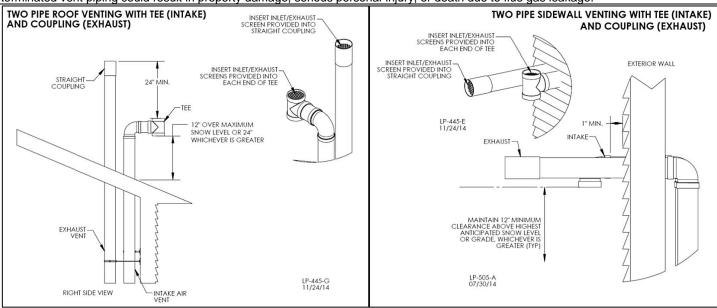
Two Pipe Roof and Sidewall Venting with Included Equipment (Tee and Coupling) - NOTE: These drawings are meant to demonstrate system venting only. The installer is responsible for all equipment and detailing required by local codes.
